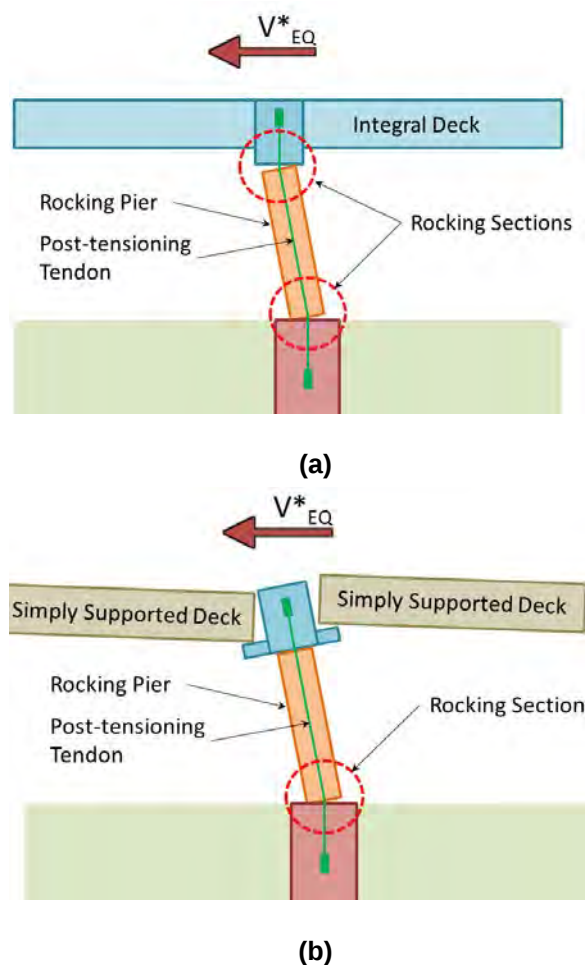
(a) Integral Bridge Rocking Arrangement, (b) Simply Supported Bridge Rocking Arrangement
